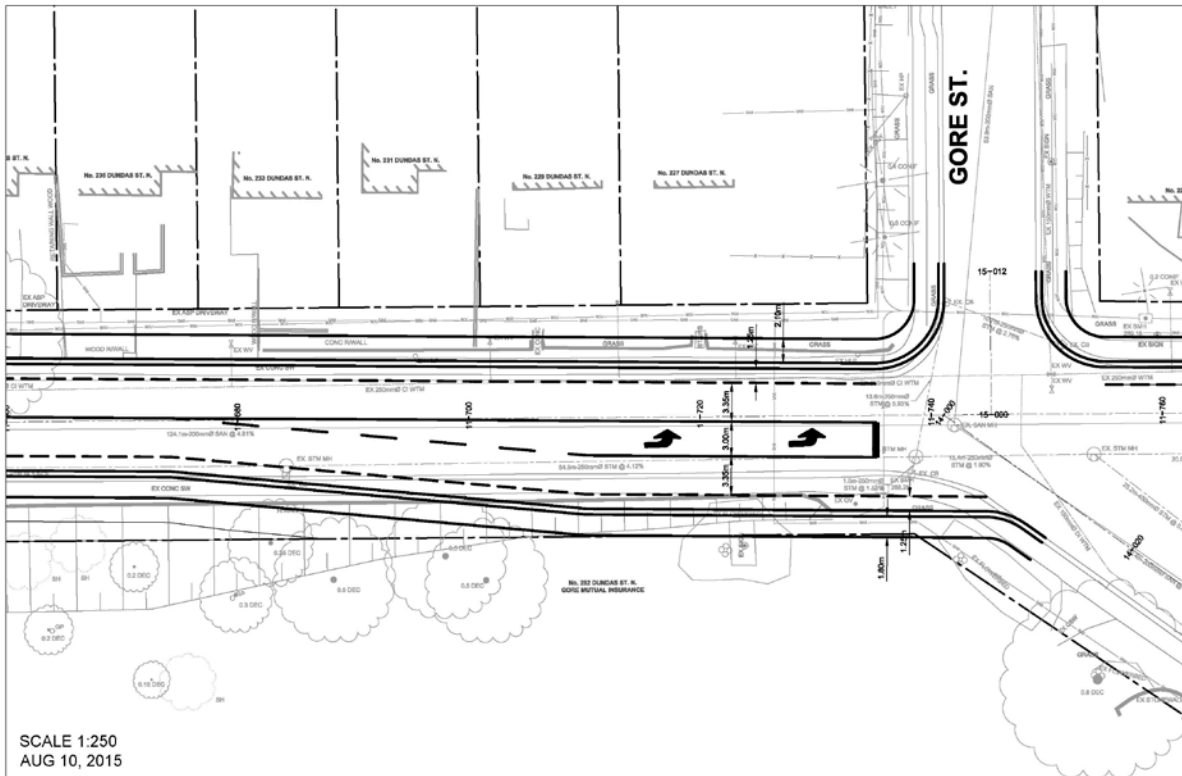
Proposed reconstruction of Dundas Street. Provided by WalterFedy August 2015.
